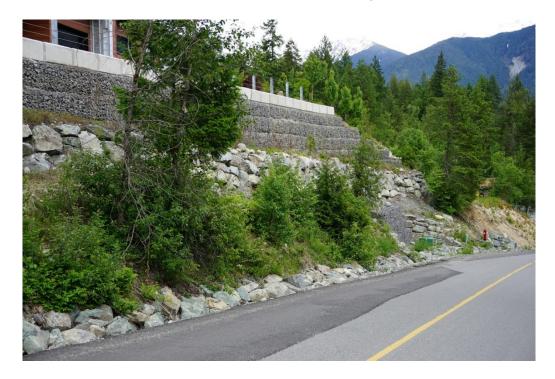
Local retaining wall example 3 of 6. Example of how each row of gabions step back to easily achieve a 1H:1V slope. Location: main access to The Ridge.
